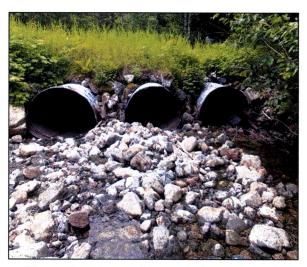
Substrate impounded upstream of culvert inlets at waypoint 435.
